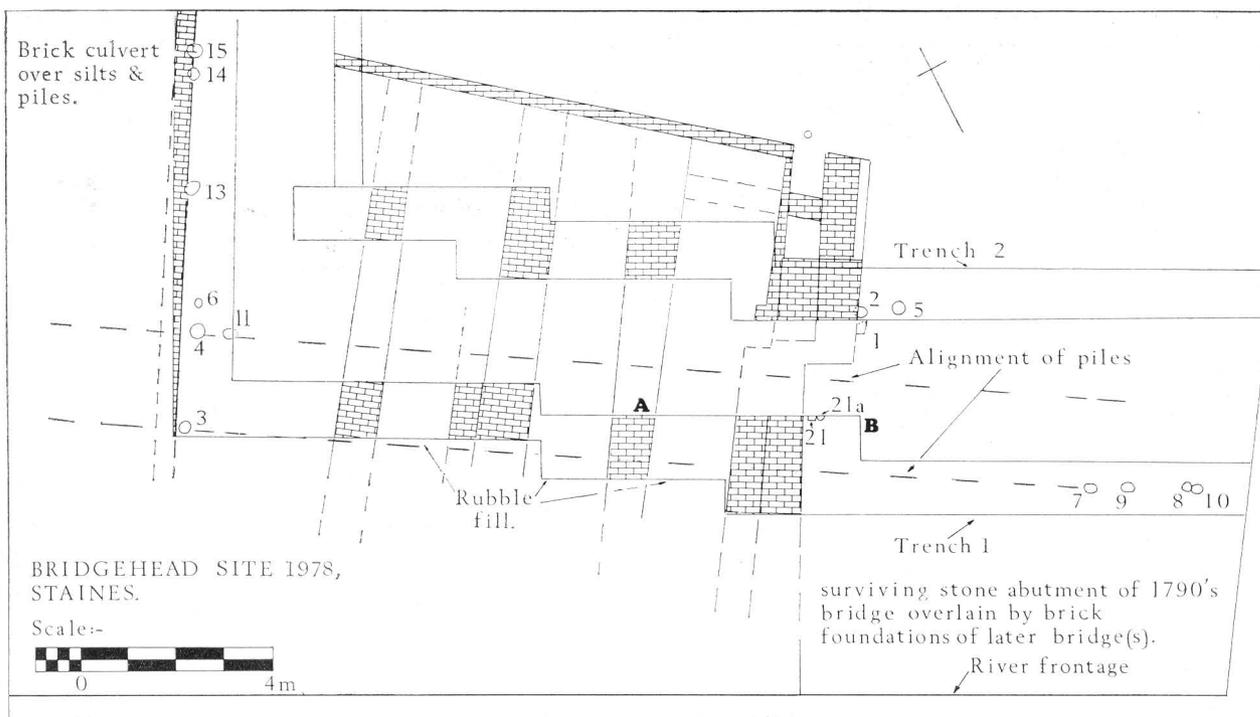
Bridgehead Site 1978, Staines, Middlesex. Plan of trenches and position of wooden piles.
